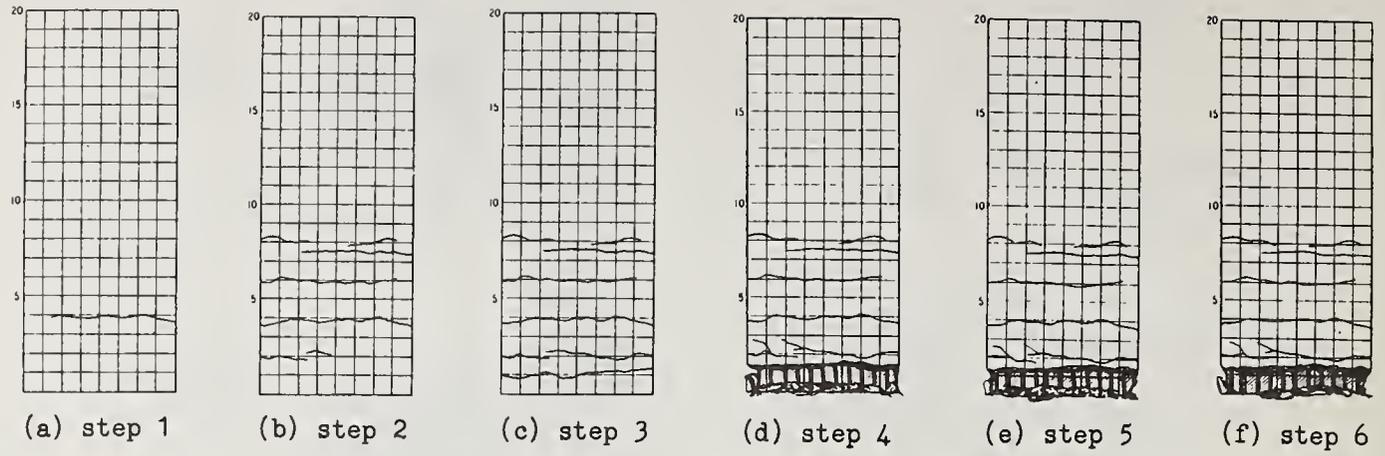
Failure Mode for Specimen with Unilateral Loading (P-37)
